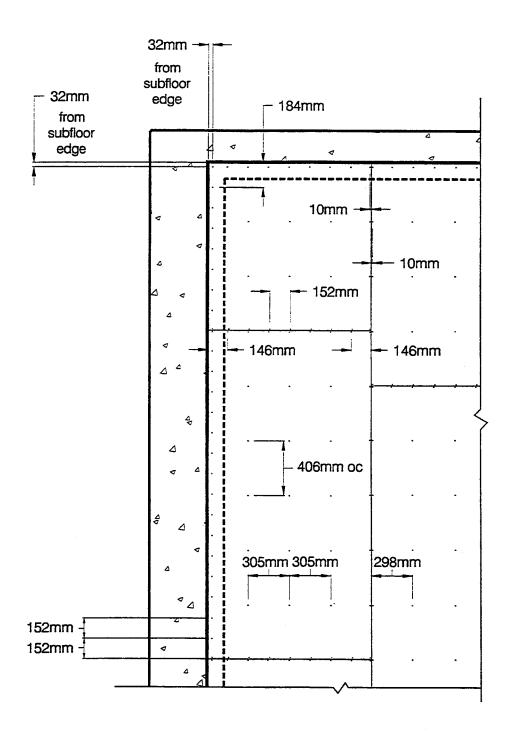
Screw pattern for single layer subfloor, joists 406 mm o.c.
